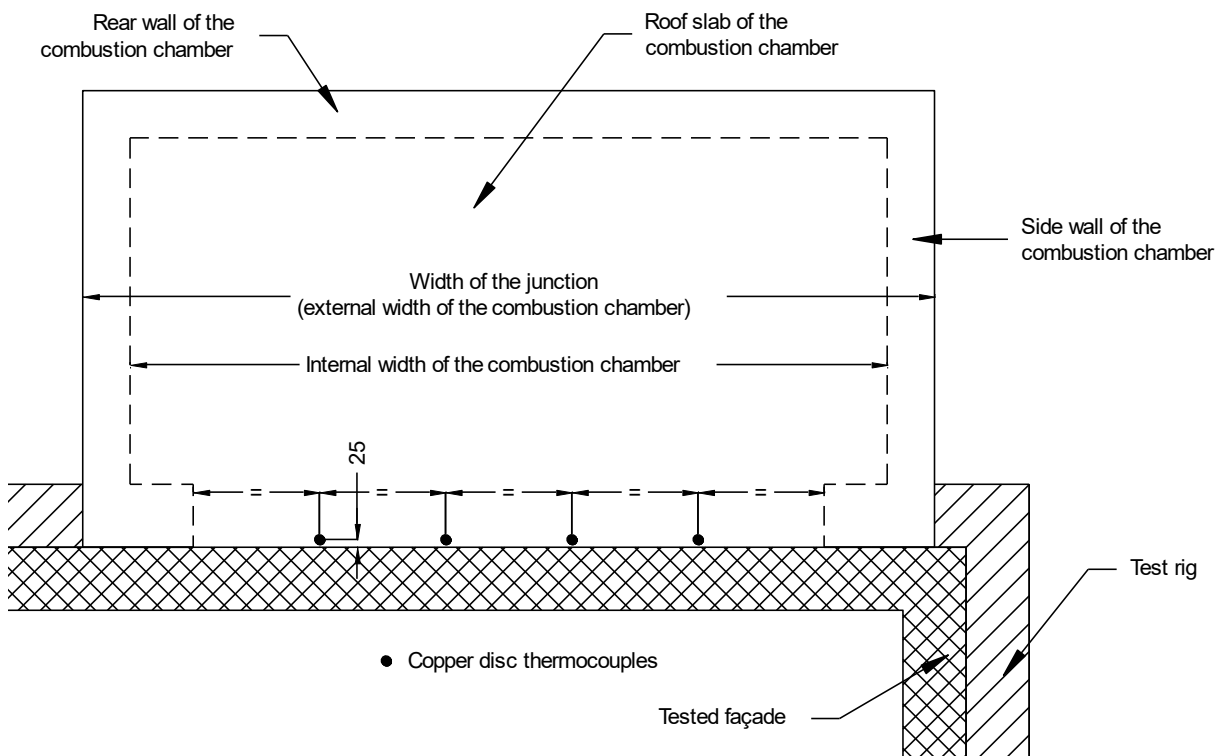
Instrumentation at the junction between façade and floor in absence of any discrete area. The view is from above the floor (the roof of the combustion chamber).
